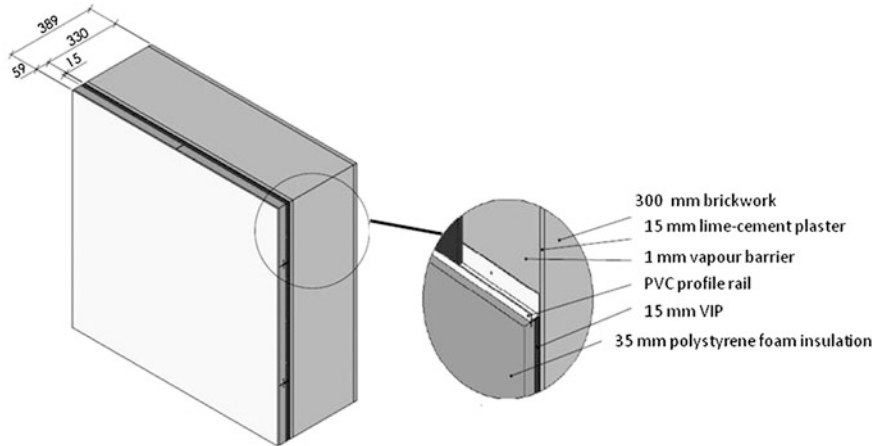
Wall structure of the renovated wall. Finally, a finish of 3 mm of reinforcement plaster and 3 mm of synthetic resin plaster were applied
